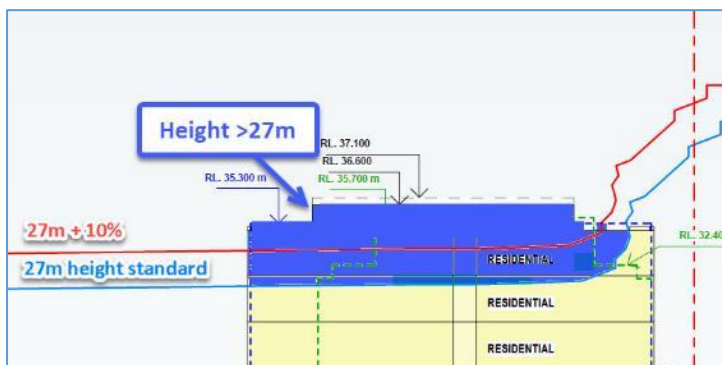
Building B - Jones Street Section Detail: Height >27m (Sydney LEP 2012, clause 4.3)
